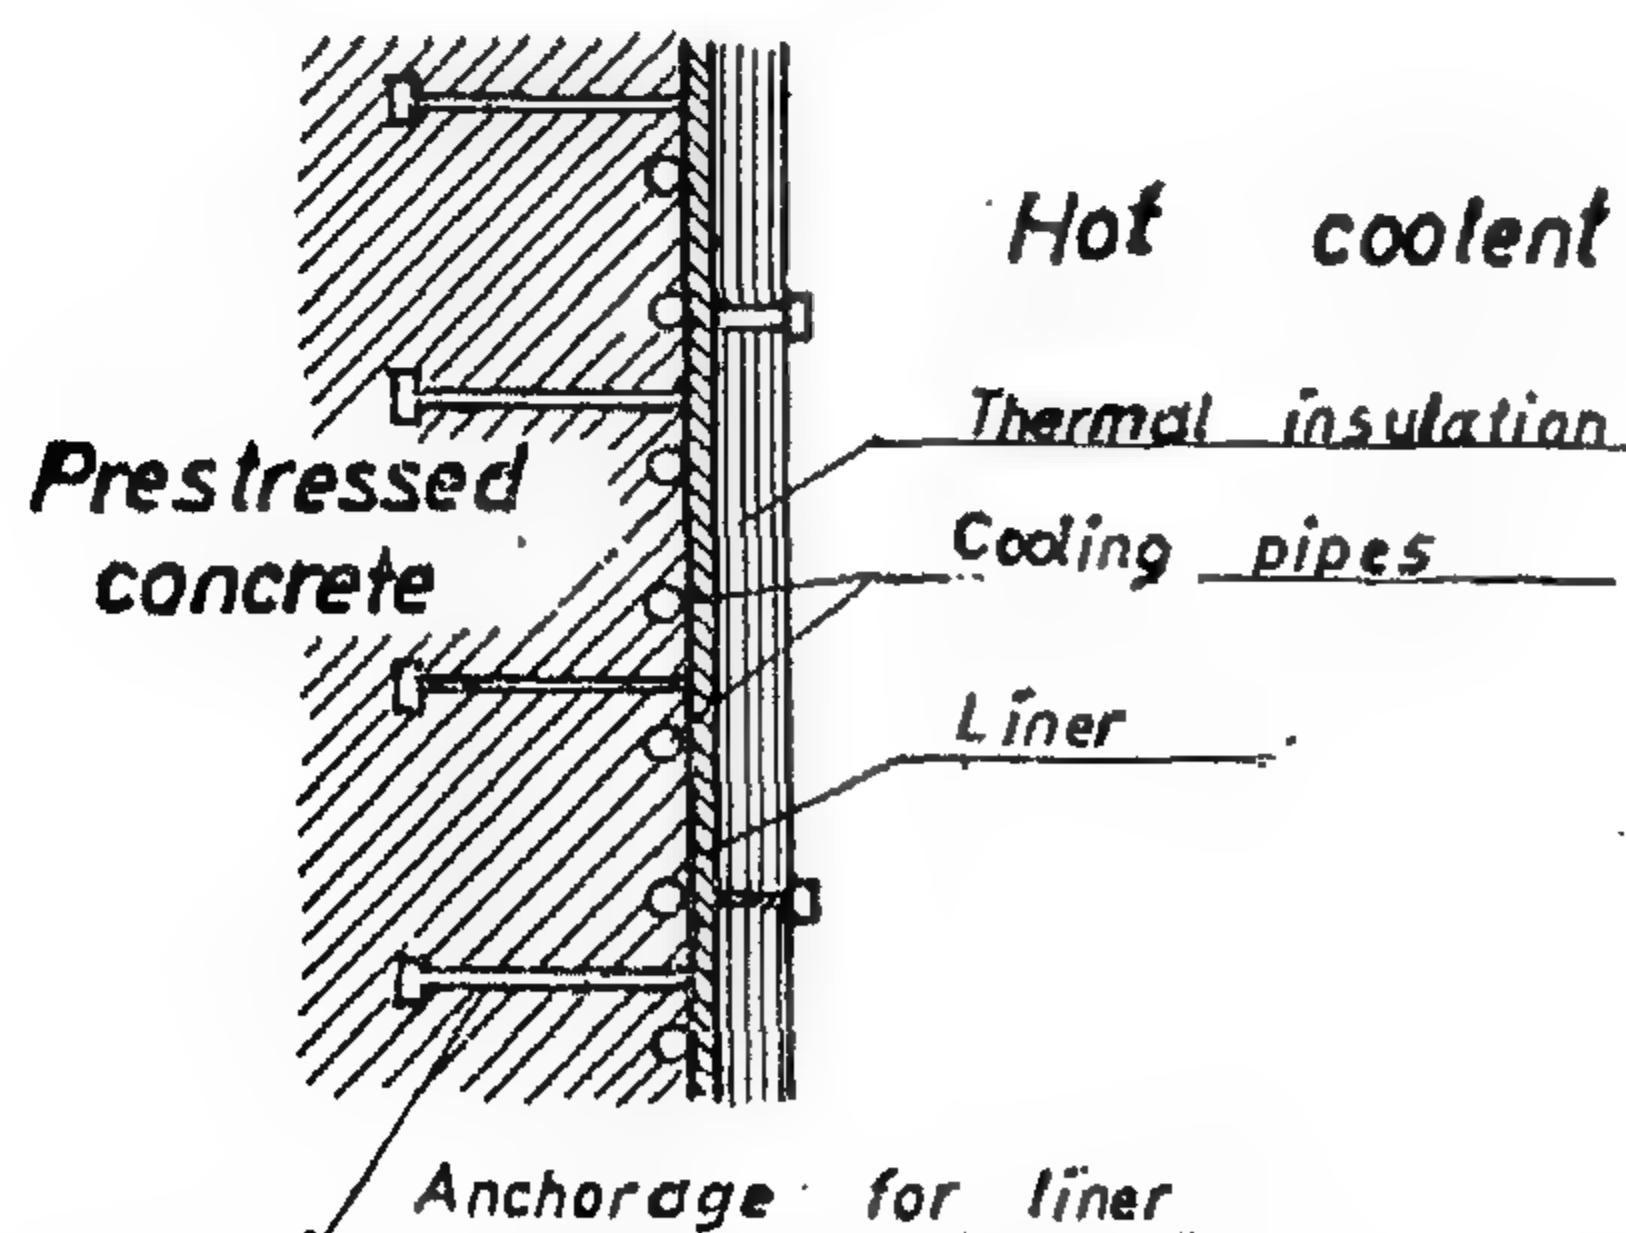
Liner Thermal Insulation and cooling system of a prestressed concrete pressure vessel
